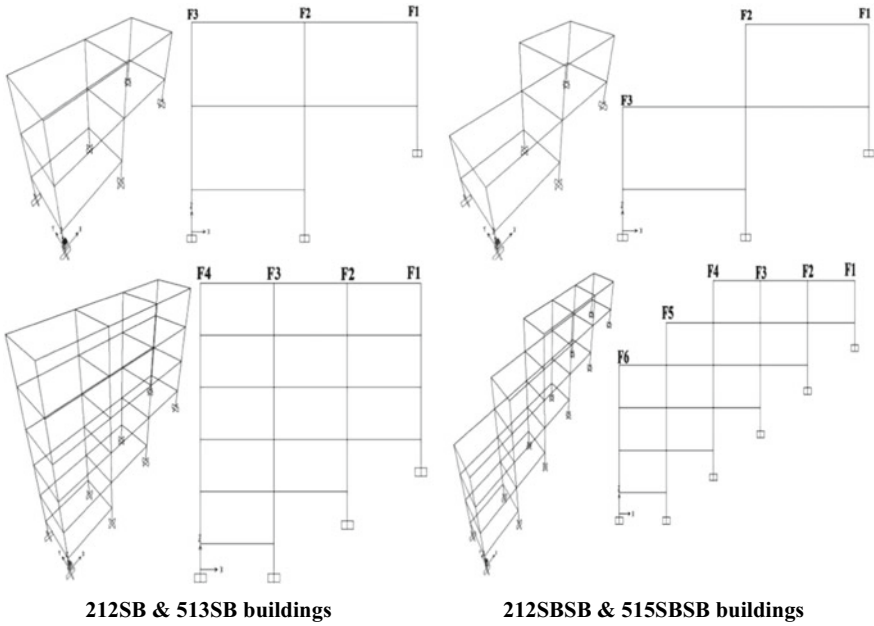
Step-Back (SB) and Step-Back-Set-Back (SBSB) buildings (two and five storey buildings)
